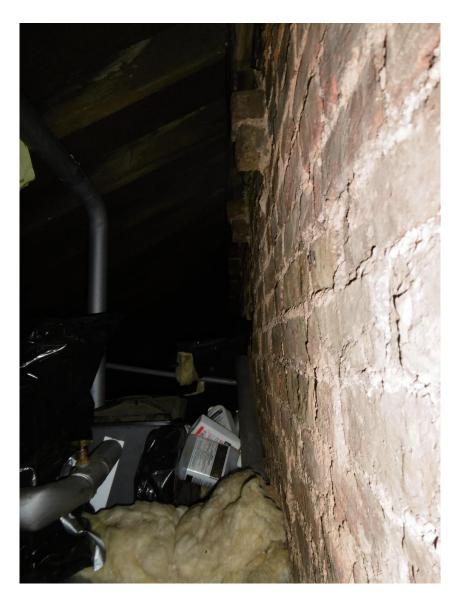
Bow to parapet showing no sign of cracking
